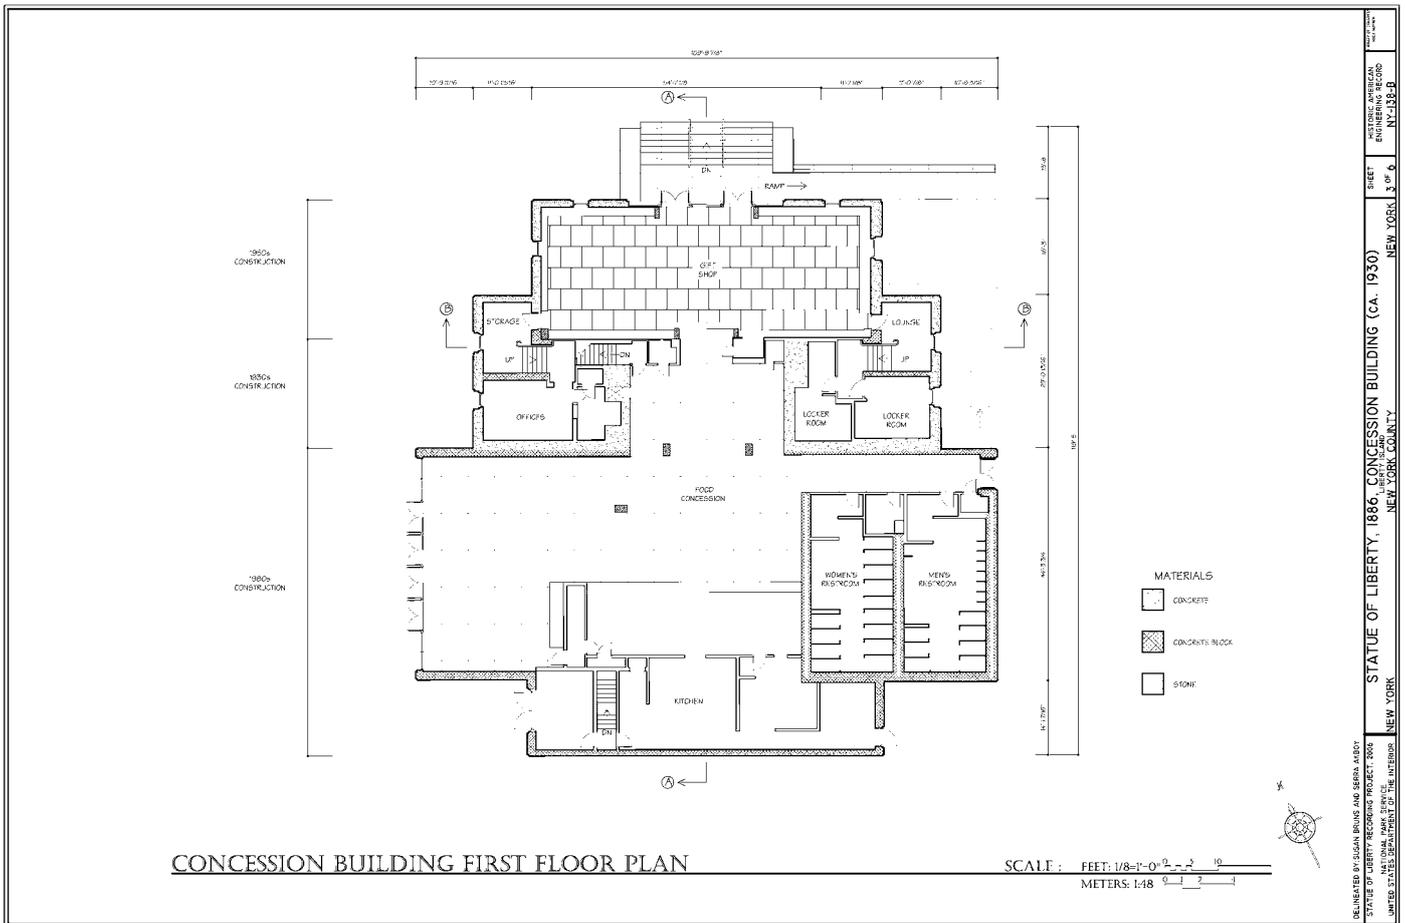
First floor plan drawing of the concession building, Statue of Liberty, Liberty Island, Manhattan, New York County, NY (HAER NY-138-B (sheet 3 of 6)).
